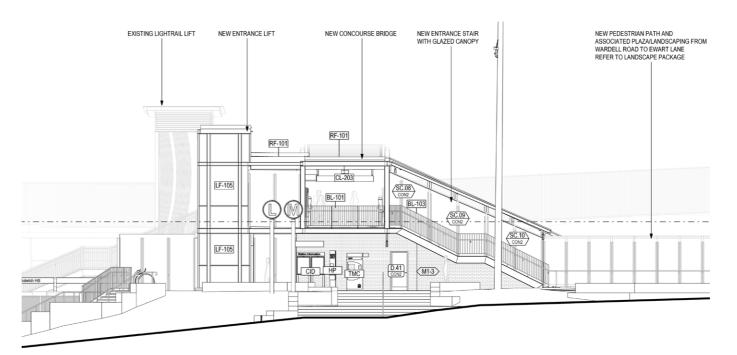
New overhead concourse: southern elevation facing Ewart Lane
